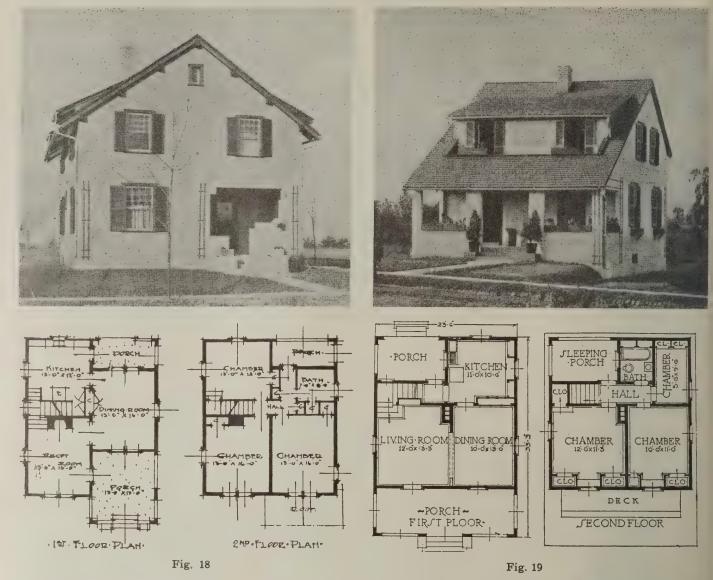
A six-room concrete house in the Craftsman style. One chimney only. All the exterior woodwork is treated with creosote stain instead of paint. The house in the foreground of Fig. 4 also has this plan, but reversed. Fig. 19—A two-story cottage at Virginia Highlands, Va. The walls are white, the woodwork gray-green. The house has six rooms and bath. It is planned to save steps in housework. Note built-in dish closet between kitchen and dining-room,
